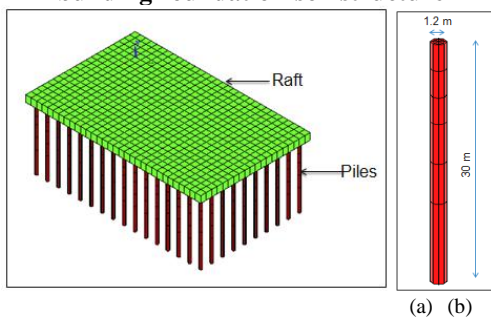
Isometric view of foundation (a) Piled raft, (b) Enlarged view of one pile
